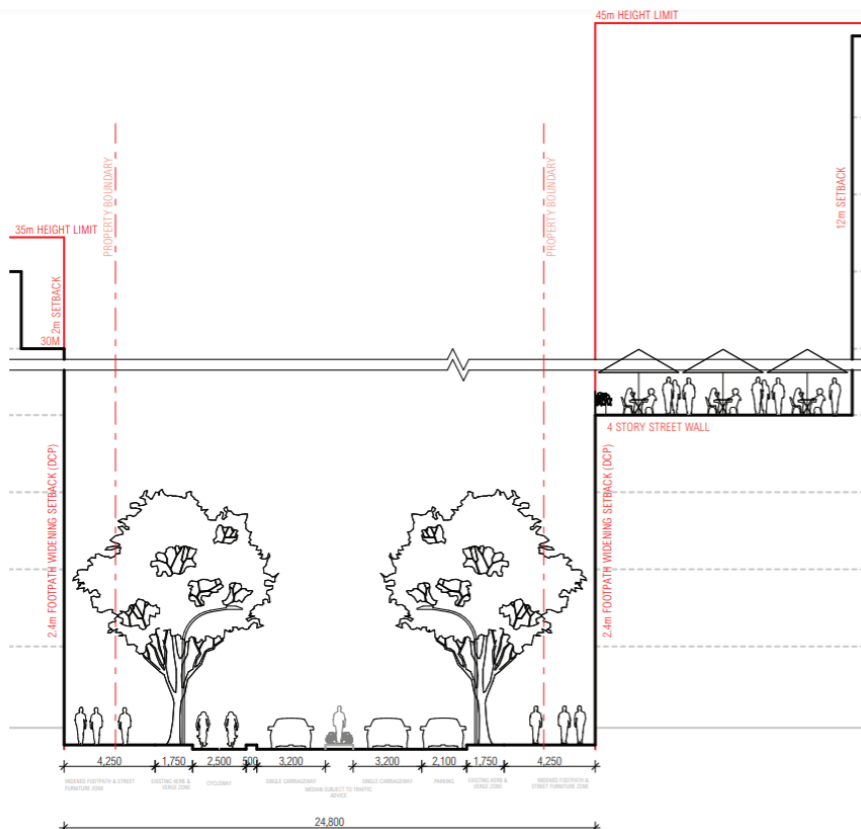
Indicative street section – Bourke Street (C), North Alexandria
